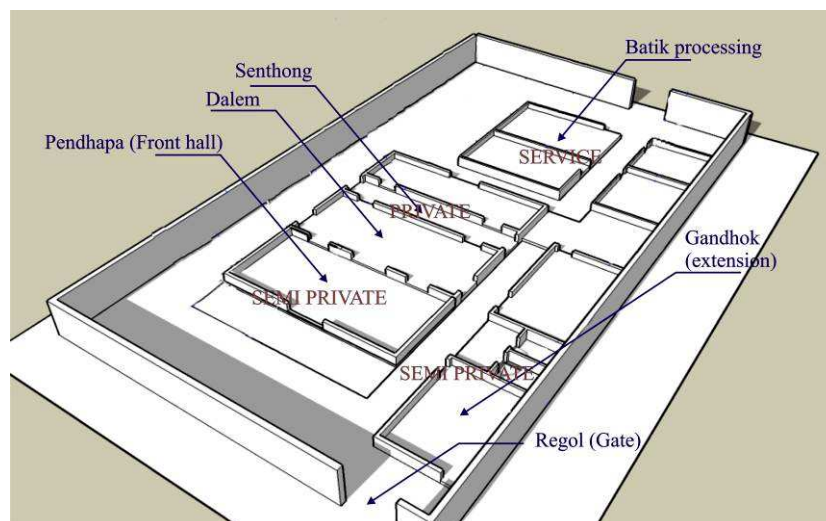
Sample [A] of the Javanese house: Original plan.
